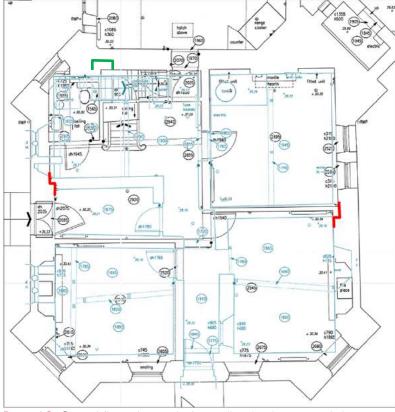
Ground-floor plan overlaid on cellar plan: locations of changes in external wall thickness, blocked fireplace.
